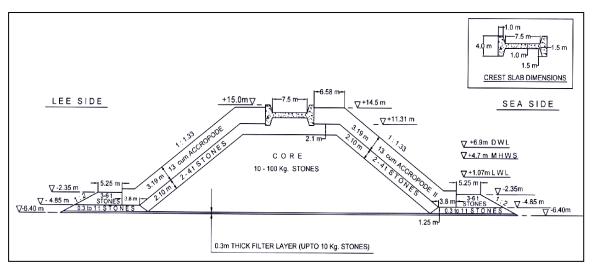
Roundhead cross section (-6.4 m) of breakwater.
